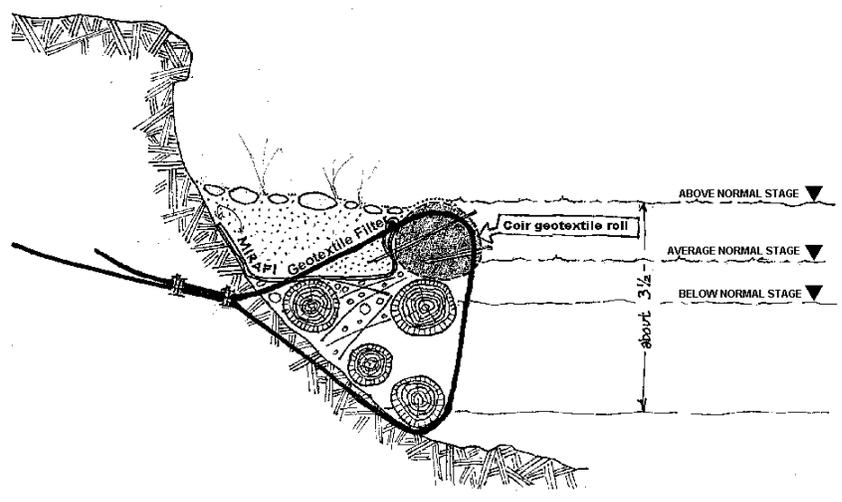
Schematic of log revetment with coir geotextile roll and plantings on top of backfill soil over a geotextile filter. (Designed by Alan Czenkusch, Colo. Division of Wildlife)
